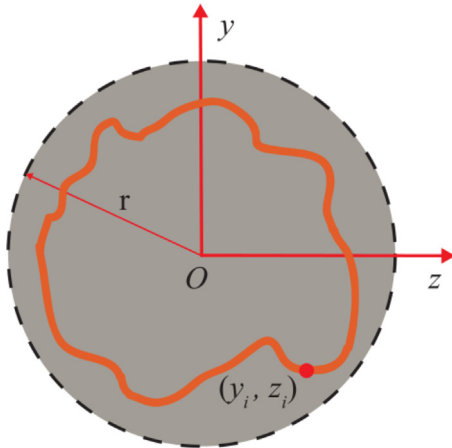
Corrosion condition of a section of rusted rebar.
